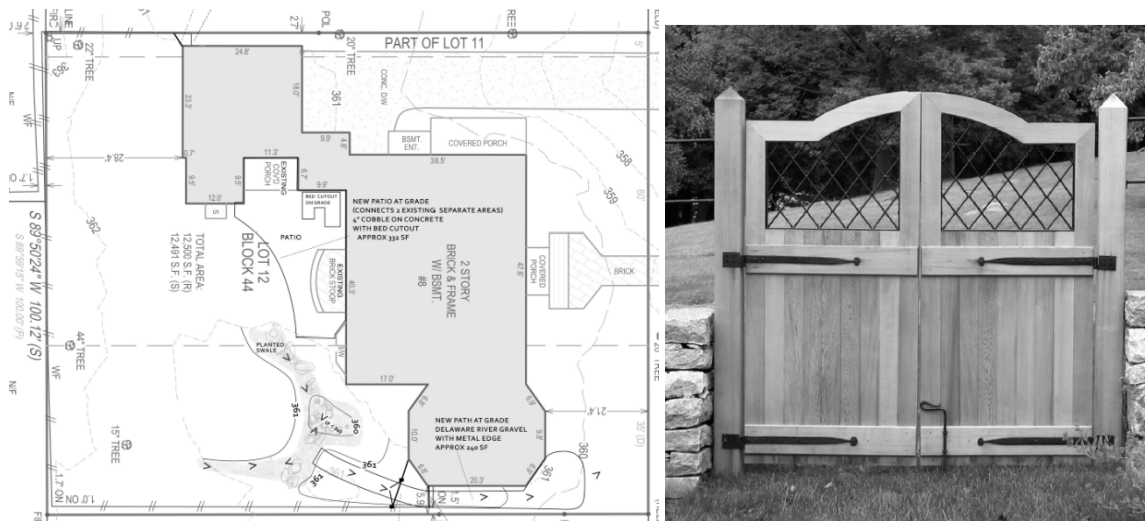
Proposed plan for new rear patio (left) and style of new gate (right).
